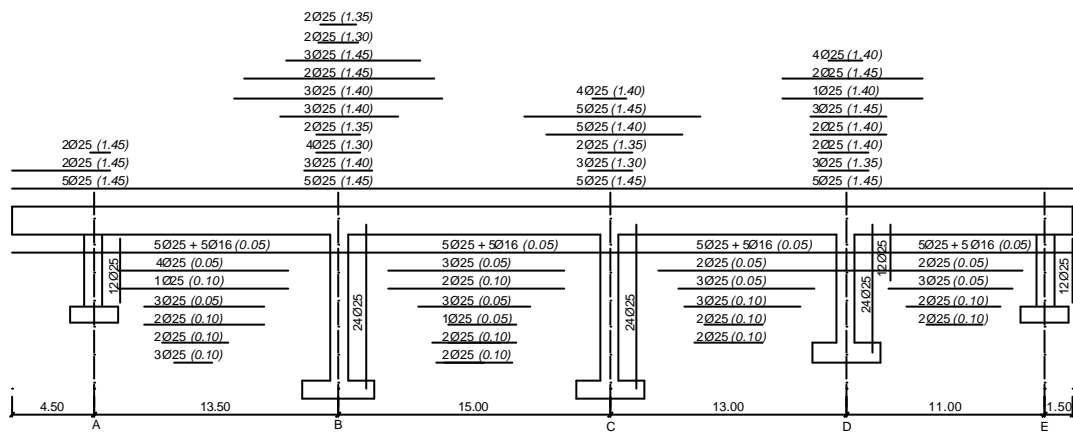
Brunna Bridge – Outline of the longitudinal reinforcement (values in parenthesis are vertical location of reinforcement measured from the bottom of the girder).
